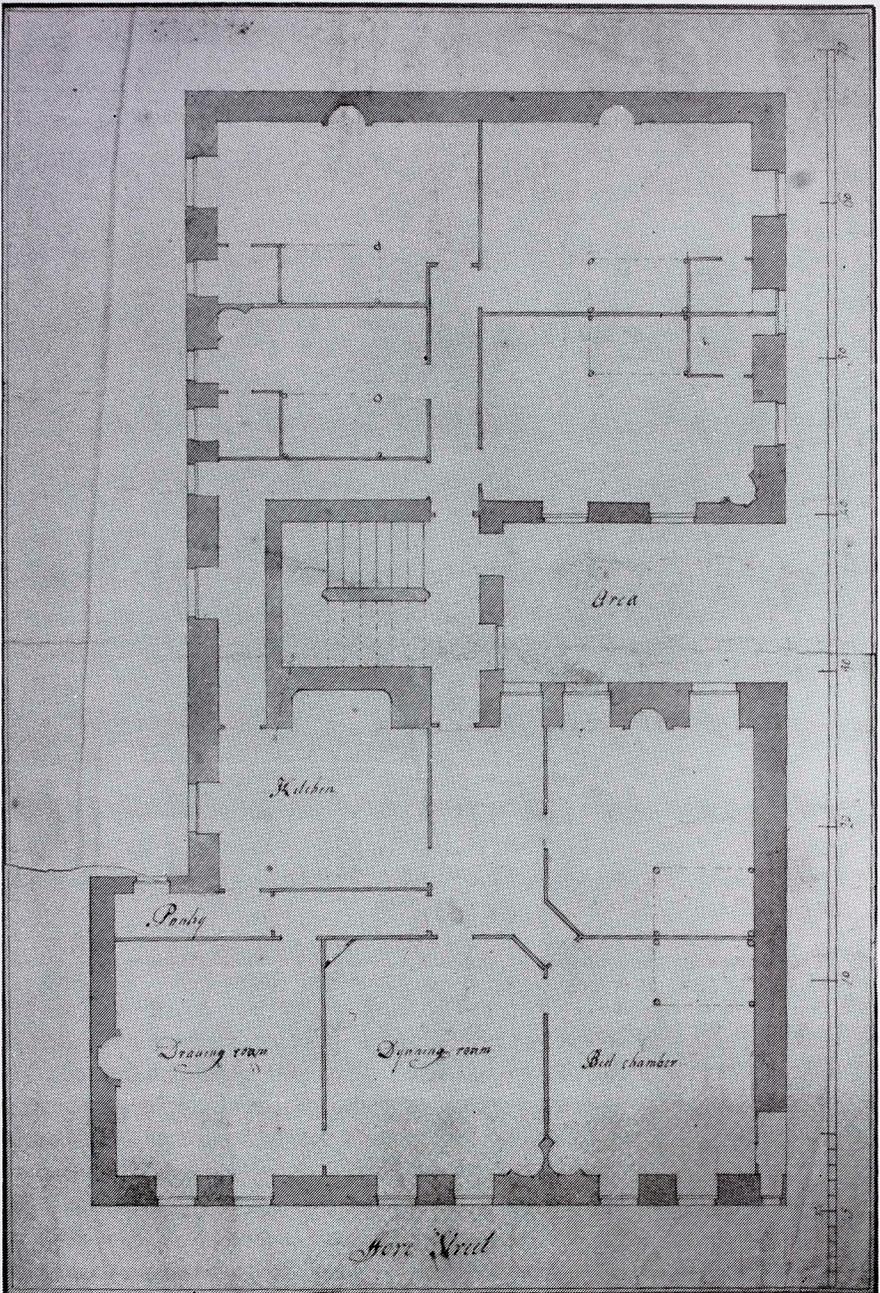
'Principal floor plan of a house': the Penicuik plan, probably showing the lodging as it existed (reproduced by courtesy of Sir John Clerk of Penicuik and RCAHMS)
